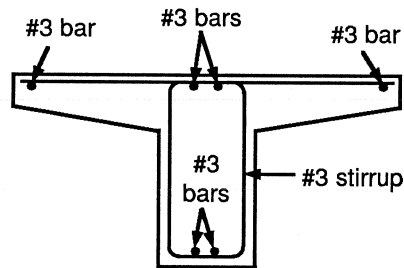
Passive, Longitudinal, Transverse, and Confining Reinforcement in Large-Scale Beams
